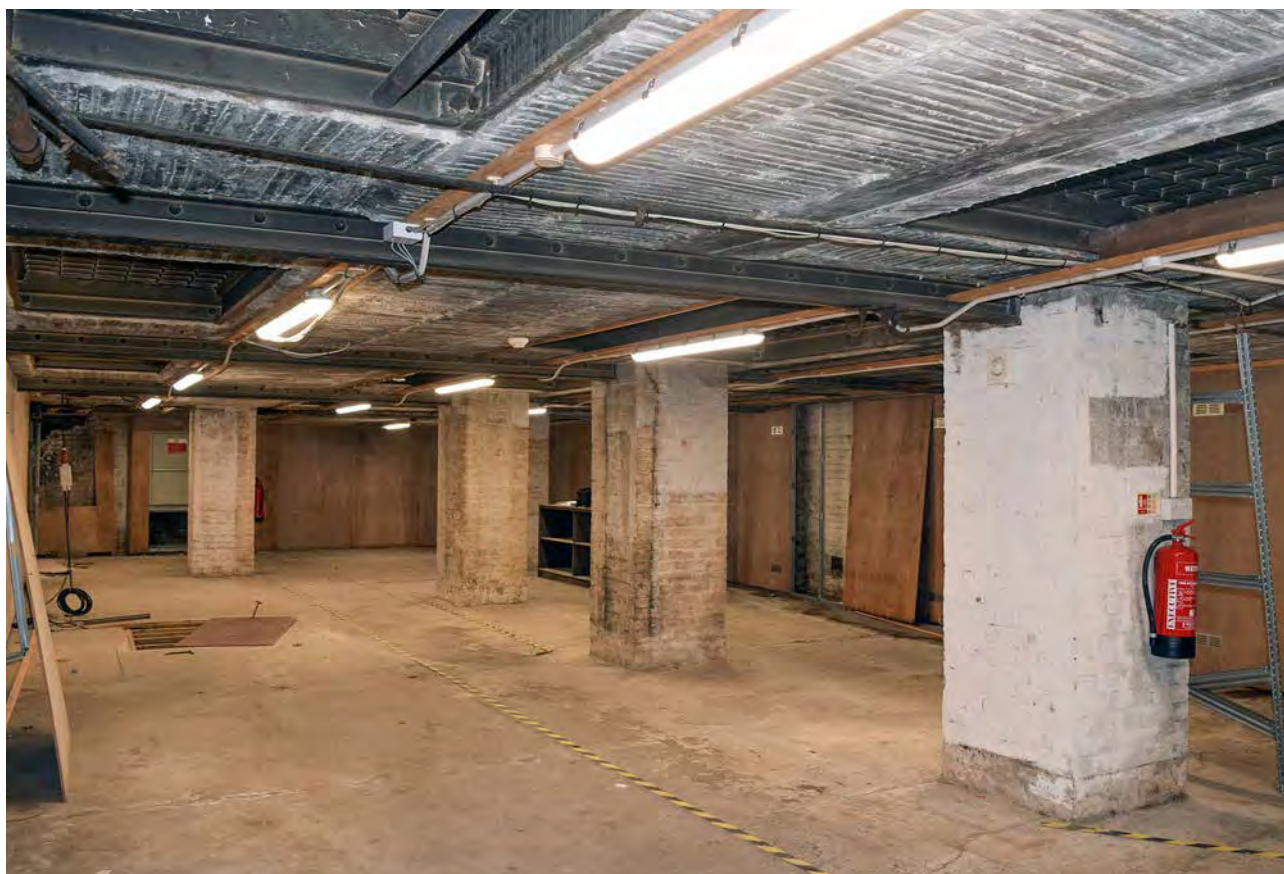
The sub basement of 31 Cornmarket Street, looking east
